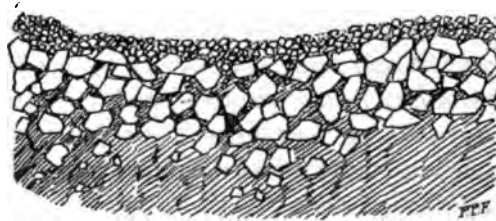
Cross section of macadam road showing result of placing stone on loose or wet earth foundation.
